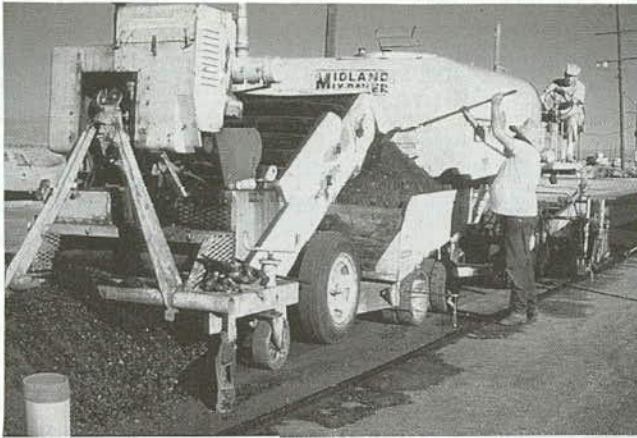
Traveling mixer using windrow elevator for recycled asphalt pavement pickup.
